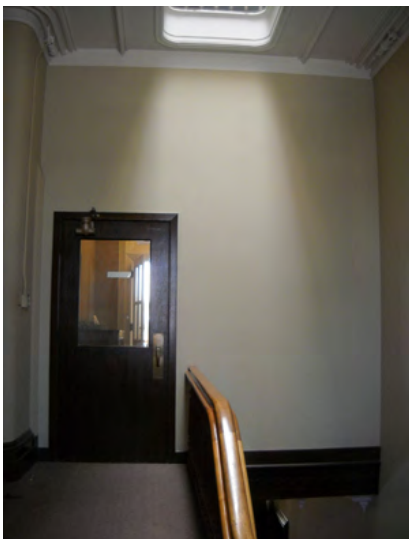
Current view of the fire-rated wall separating the North Central Hall from the rest of the Central Hall.
